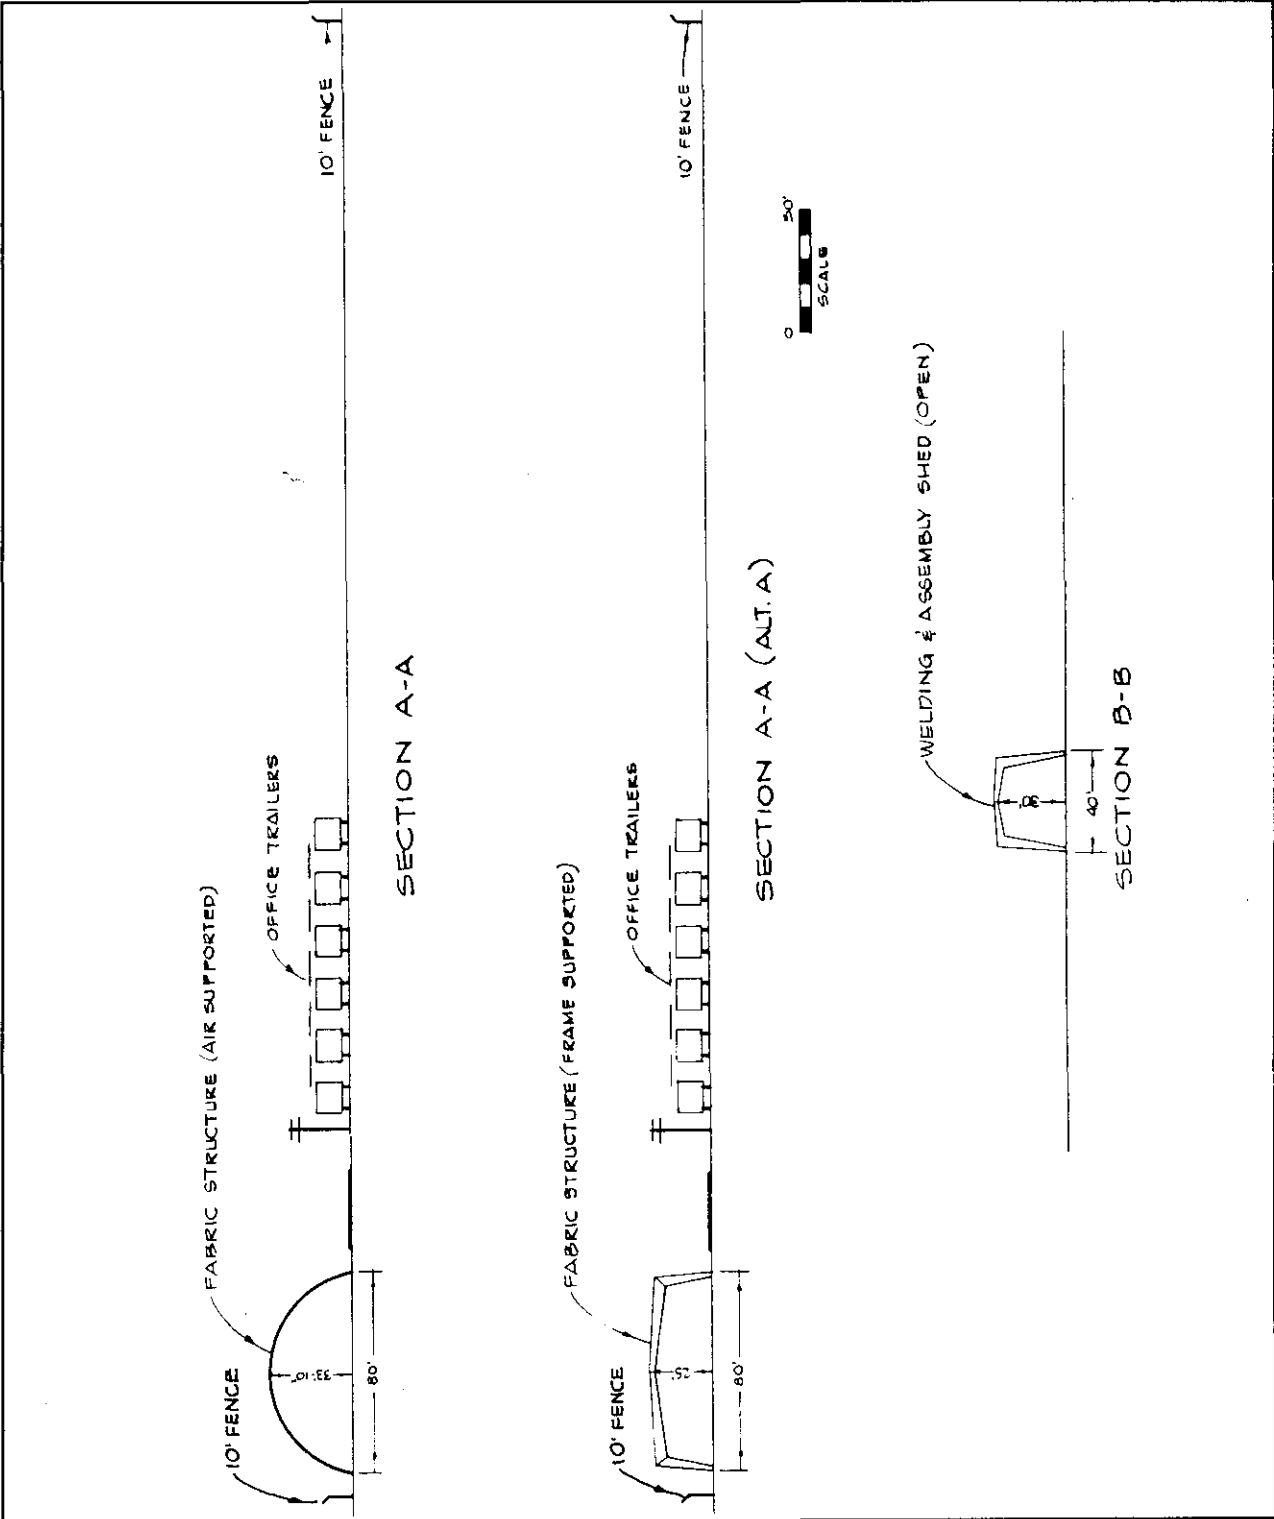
Preliminary Elevation Drawings of the Temporary Structures
